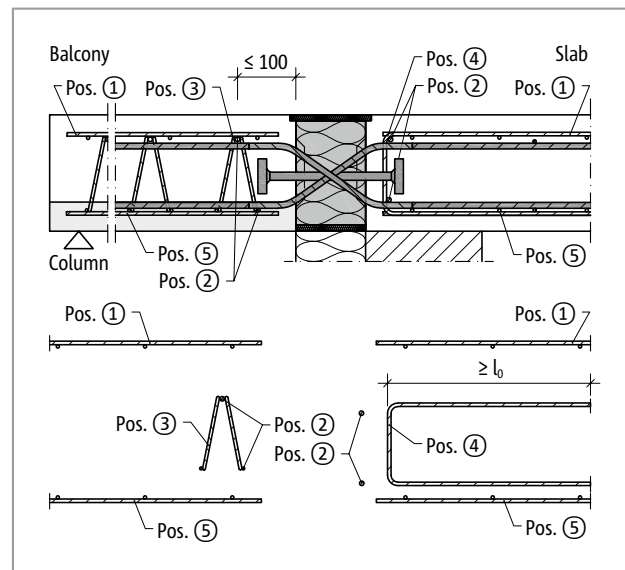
Schöck Isokorb® XT type Q-P-VV: On-site reinforcement, balcony side with lattice beam
